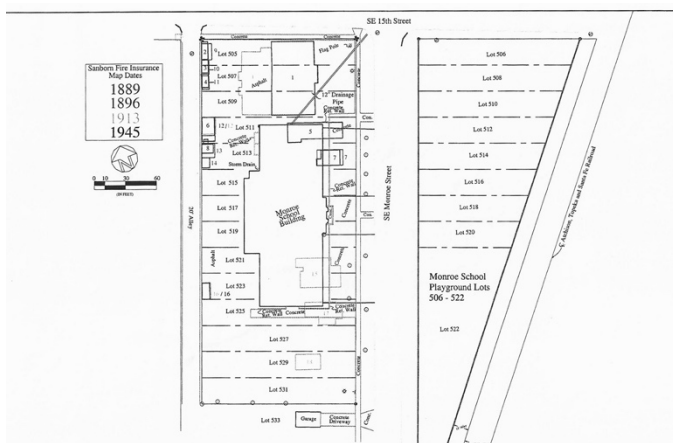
Map showing school playground area and proposed parking area on right, Monroe School on left. Plan in files of Brown v. Board of Education NHP.
